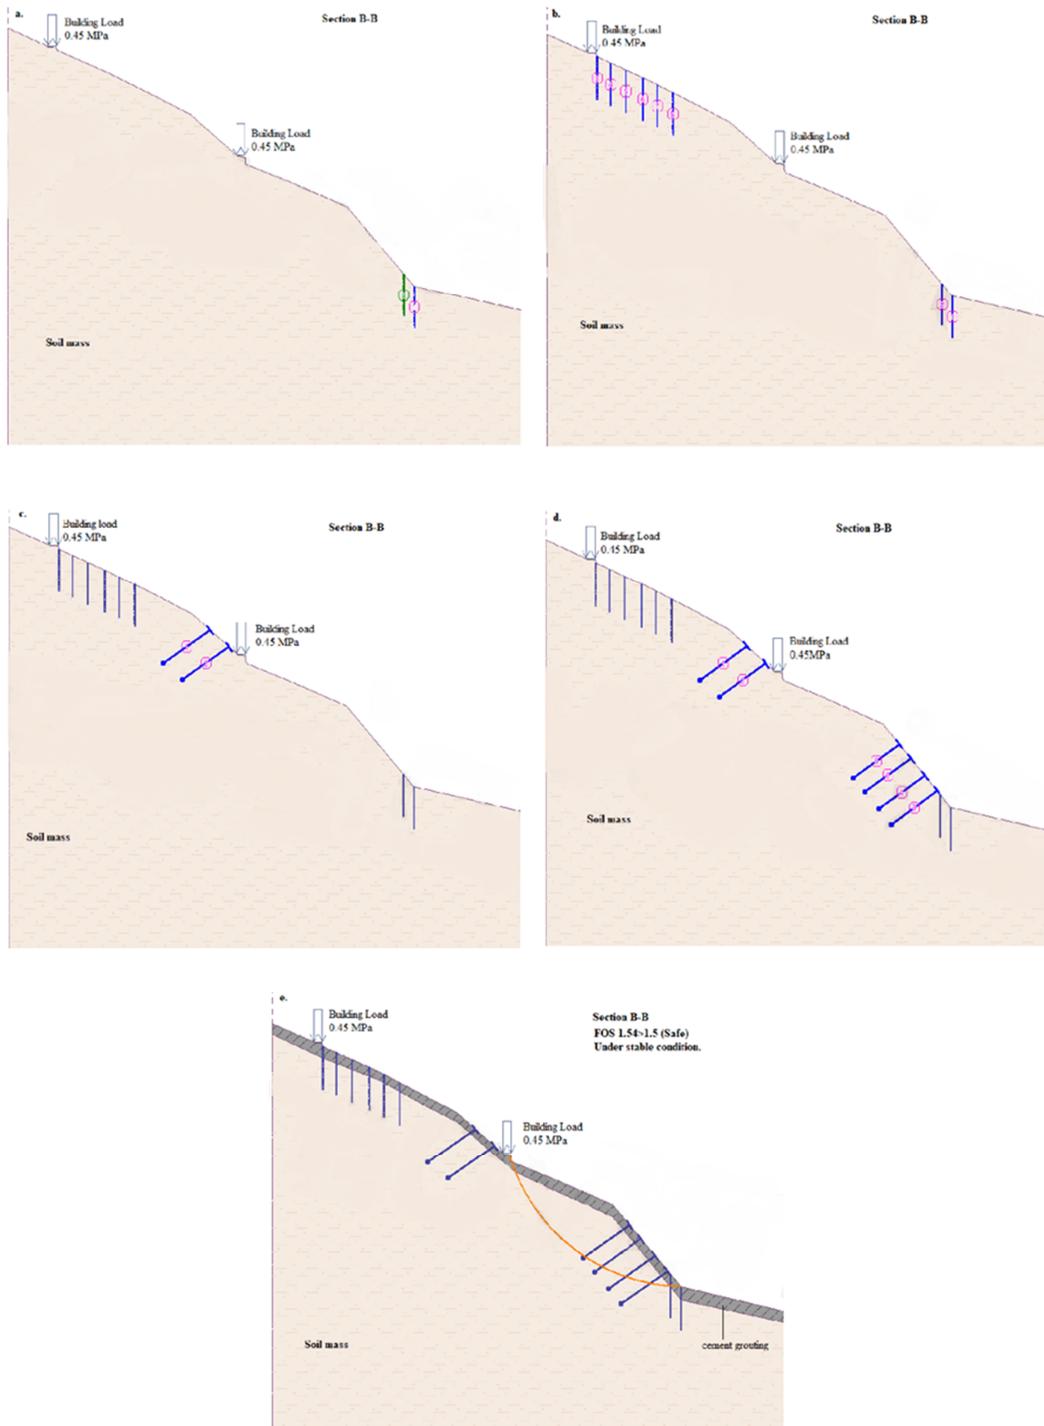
Steps involved in section B-B, (a) and (b) installation of piles. (c) and (d) installation of anchors. (e) stability checks after all remedies.
